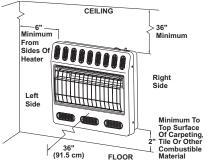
Mounting Clearances As Viewed From Front of Heater
